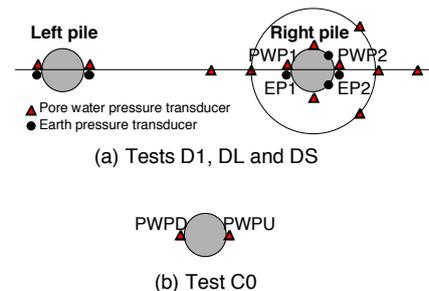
Plan view of transducers on and around piles at depth of 3 m
